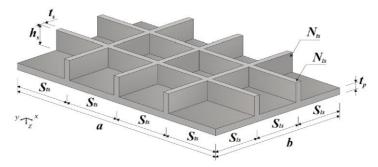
Stiffened plate with 2 longitudinal and 3 transverse stiffeners
